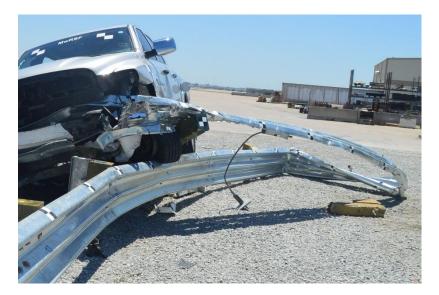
Overview of Damage to B Side of System, Test No. MSPBN-7 219
